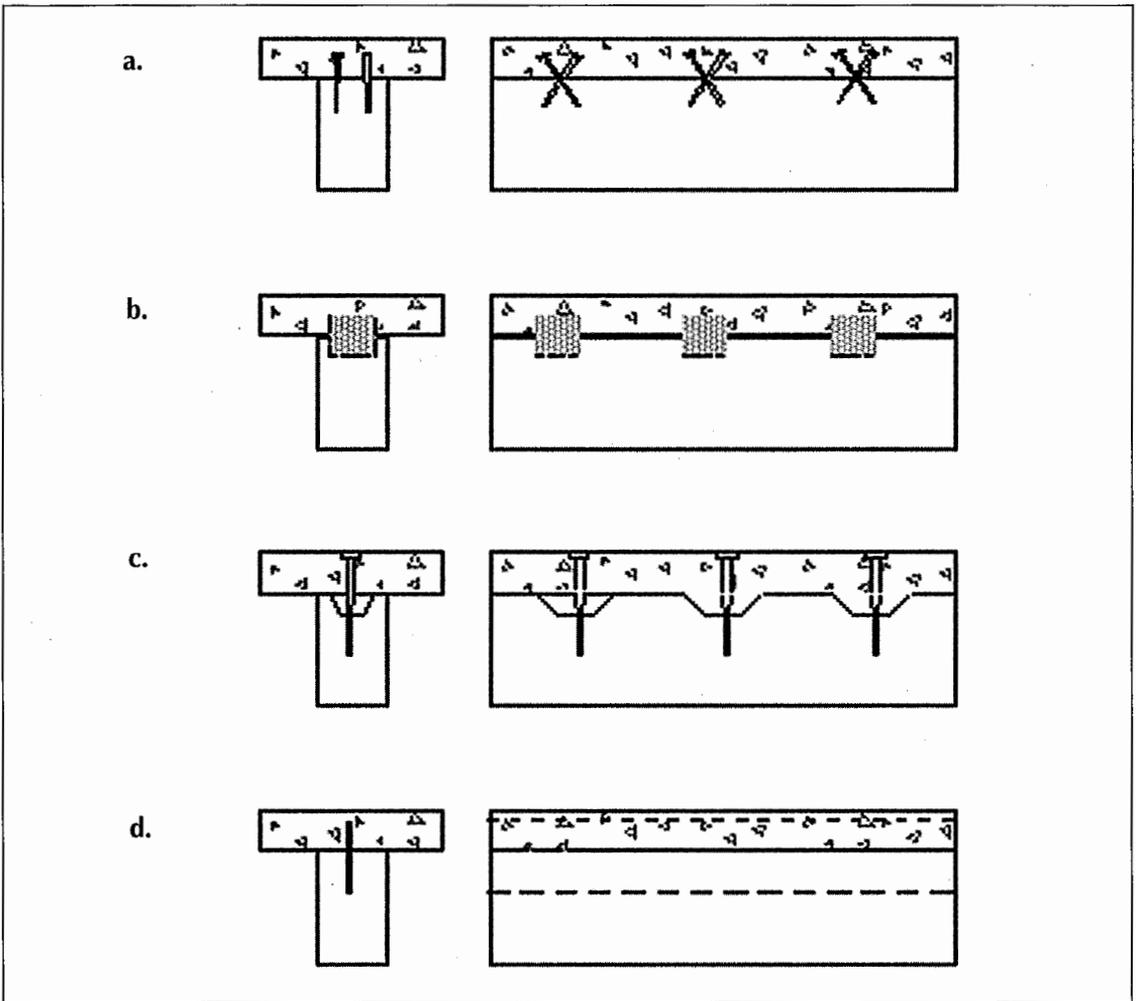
General types of shear connectors: a) dowel; b) sheet metal; c) concrete shear key with anchor; and 4) glued-in metal plate.
